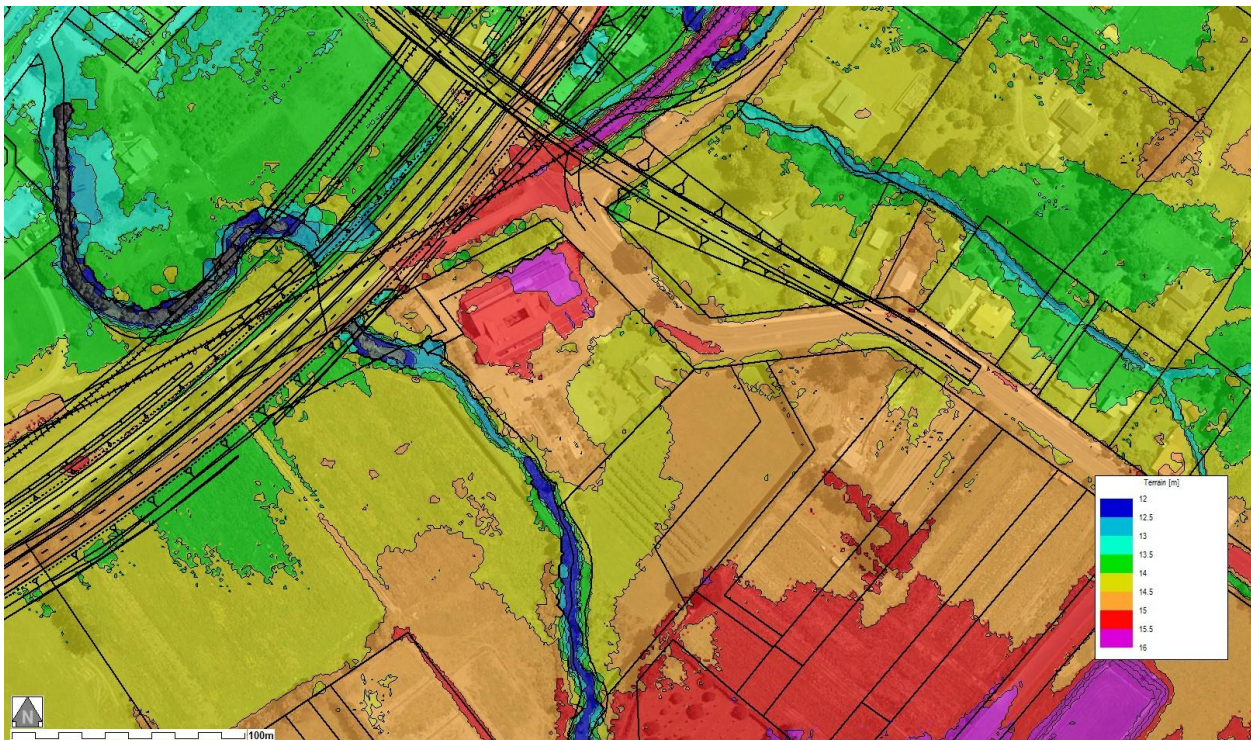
Topographic relief map for Rahui Road overflow zone with layout of proposed Rahui Road over-bridge superimposed
